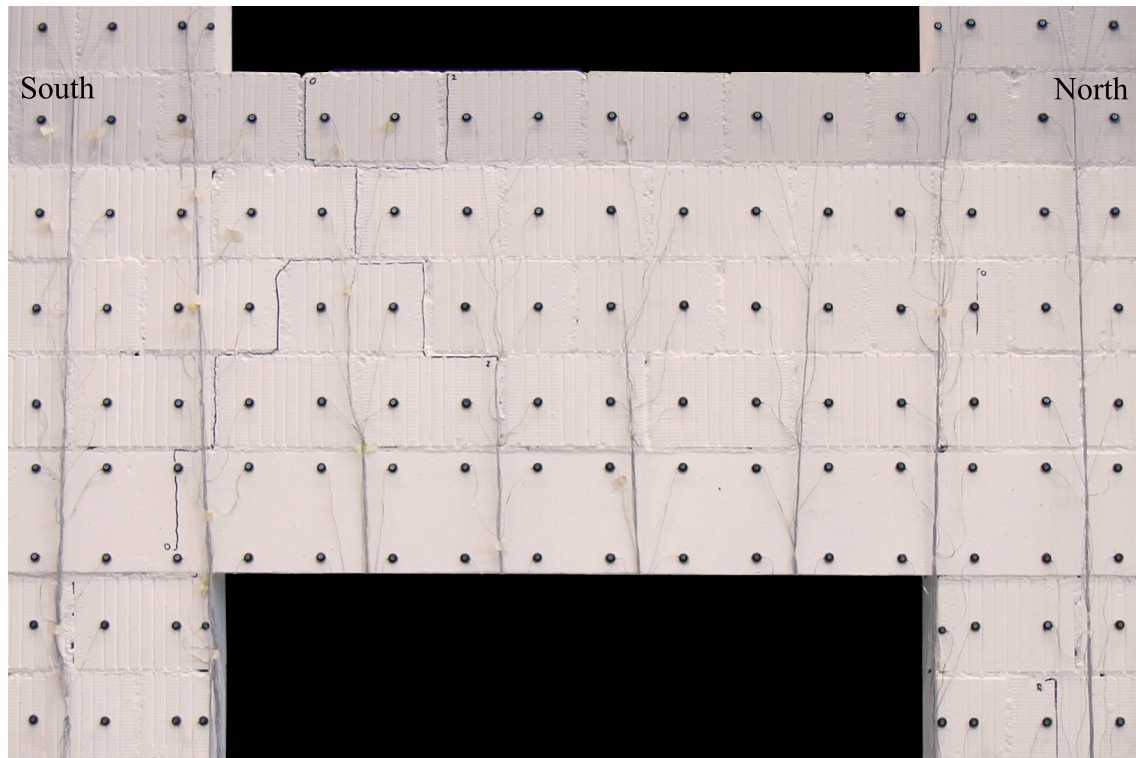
TU4: Crack pattern of spandrel at LS 2 resulting from bolting the test unit onto the lever beams.
